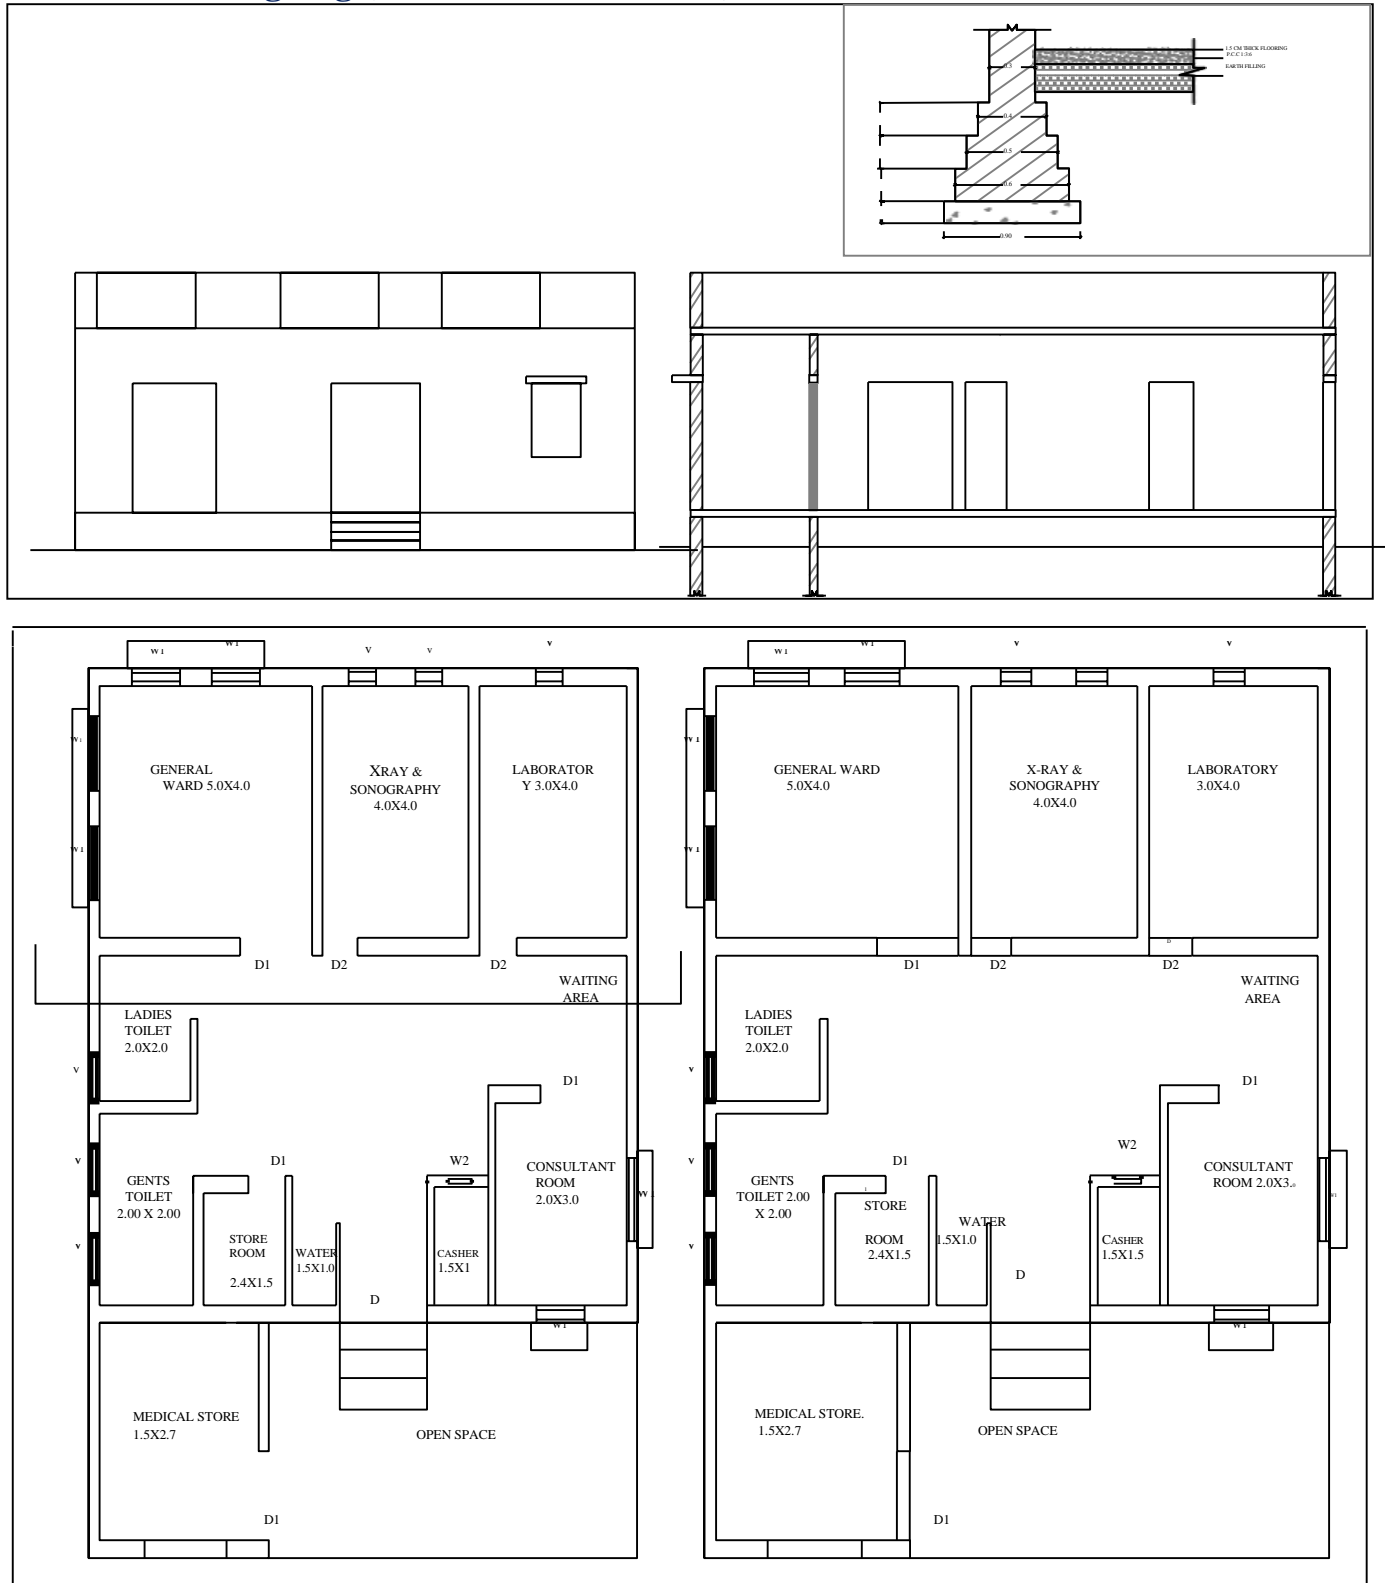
Proposed Public Health Centre (Plan, Section, Elevation)
